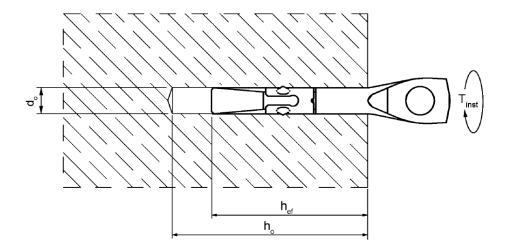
Installation parameters of TT-THROUGHBOLT steel expansion fasteners, version TWH
